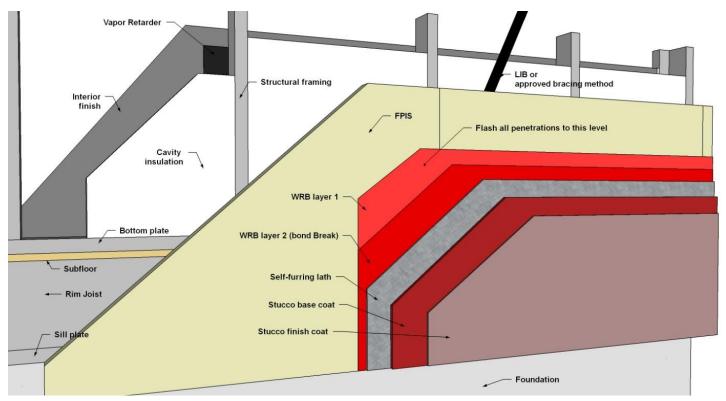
Wood-Frame Wall with LIB and Exterior Finish of FPIS, WRB, Drainage Space, and PC Stuccoxviii
